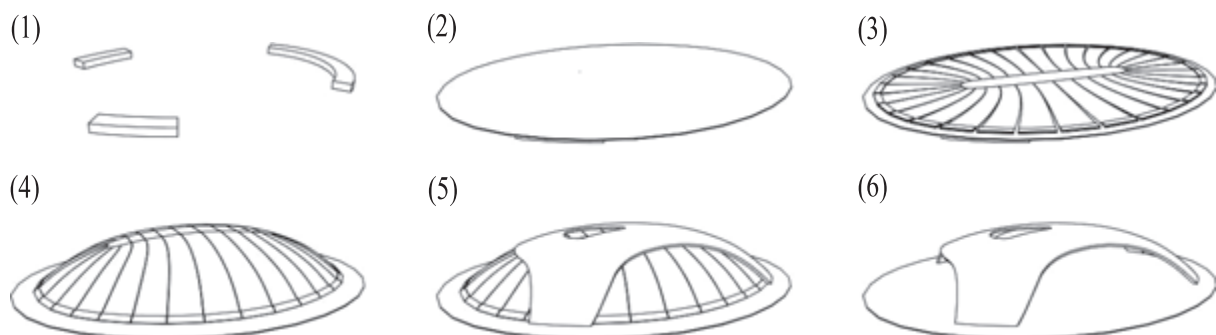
Construction procedure for the event canopy: (1) foundation, (2) flat smoothed concrete plate as operation level, (3) flat starting plate with wedge shaped outlets, (4) transformed shell, (5) application of the additional reinforcement and the additional concrete layer in the relevant areas, (6) production of the cut-outs
